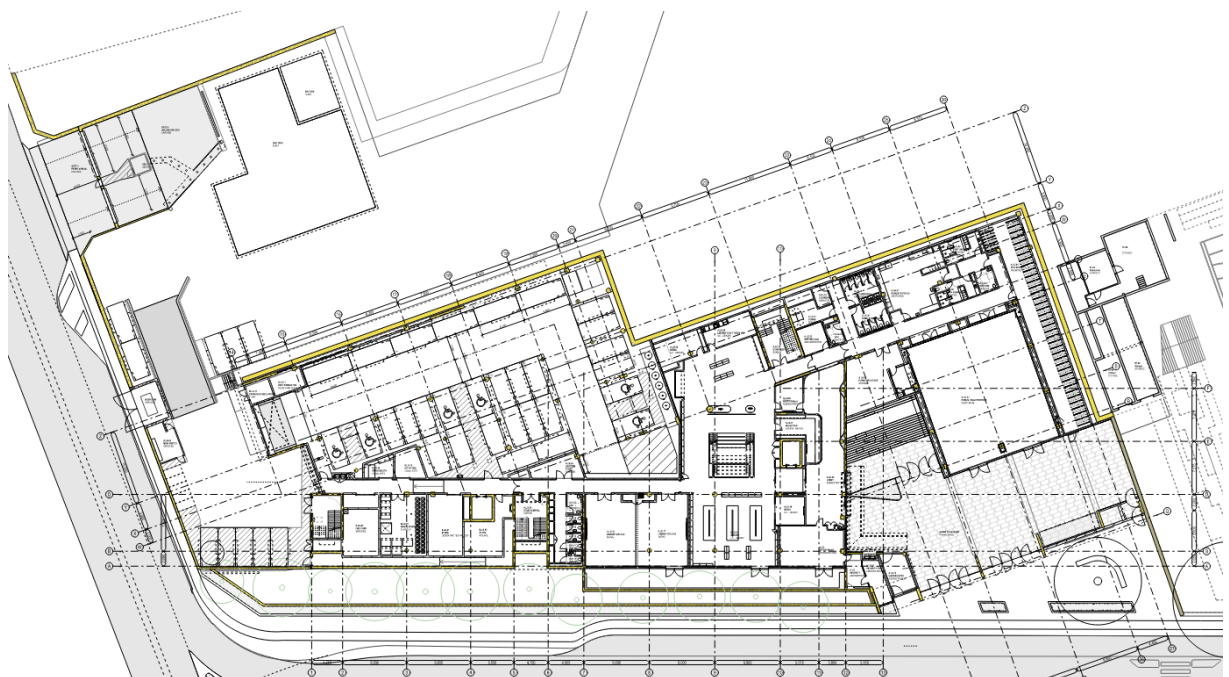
Moriah College Lower Ground General Arrangement Plan
